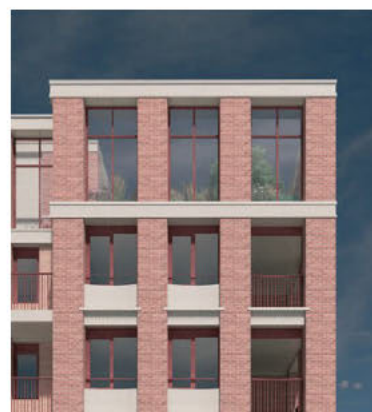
(above): View of Block D's rooftop garden, as seen facing east from Ilderton Road.
